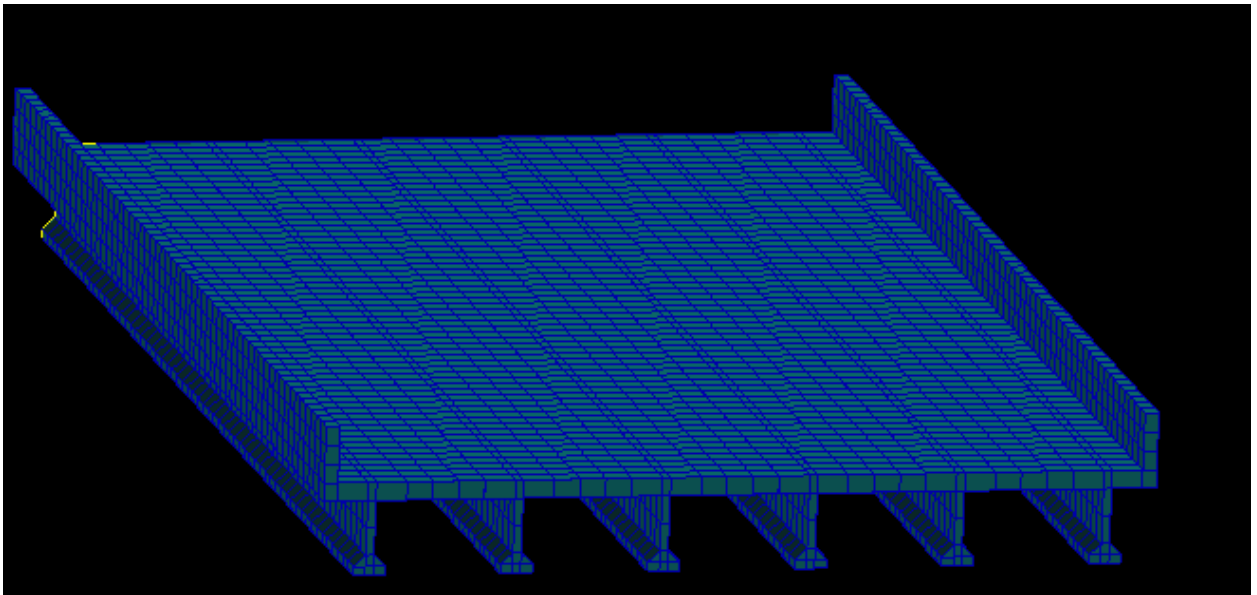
Bridge Model Used in Wind Tunnel and Wave Tank CFD simulations
